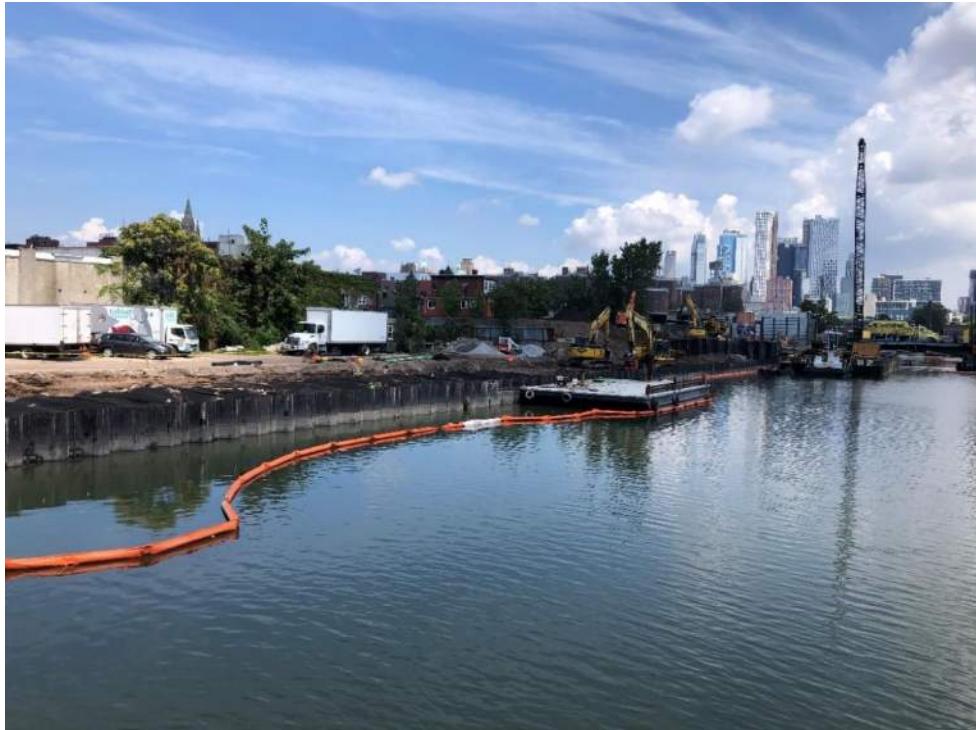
View of site at the end of the day from the Carroll Street Bridge (facing northwest).
